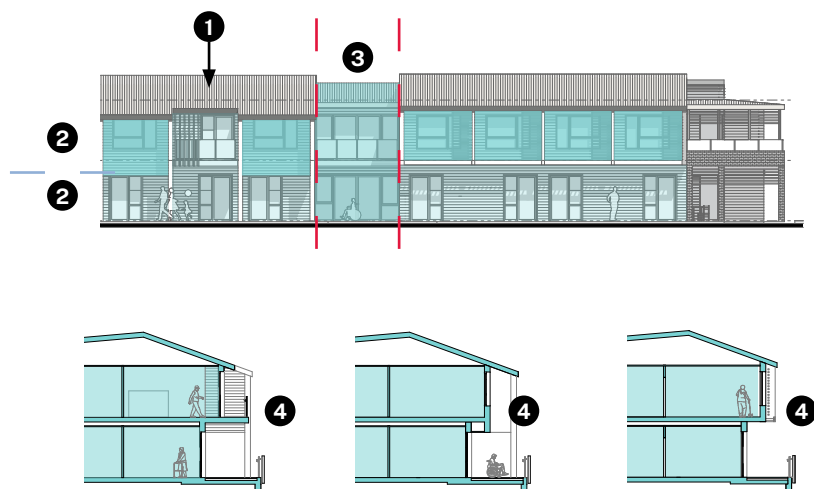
F External façade is informed by variance in resident room layout configuration
